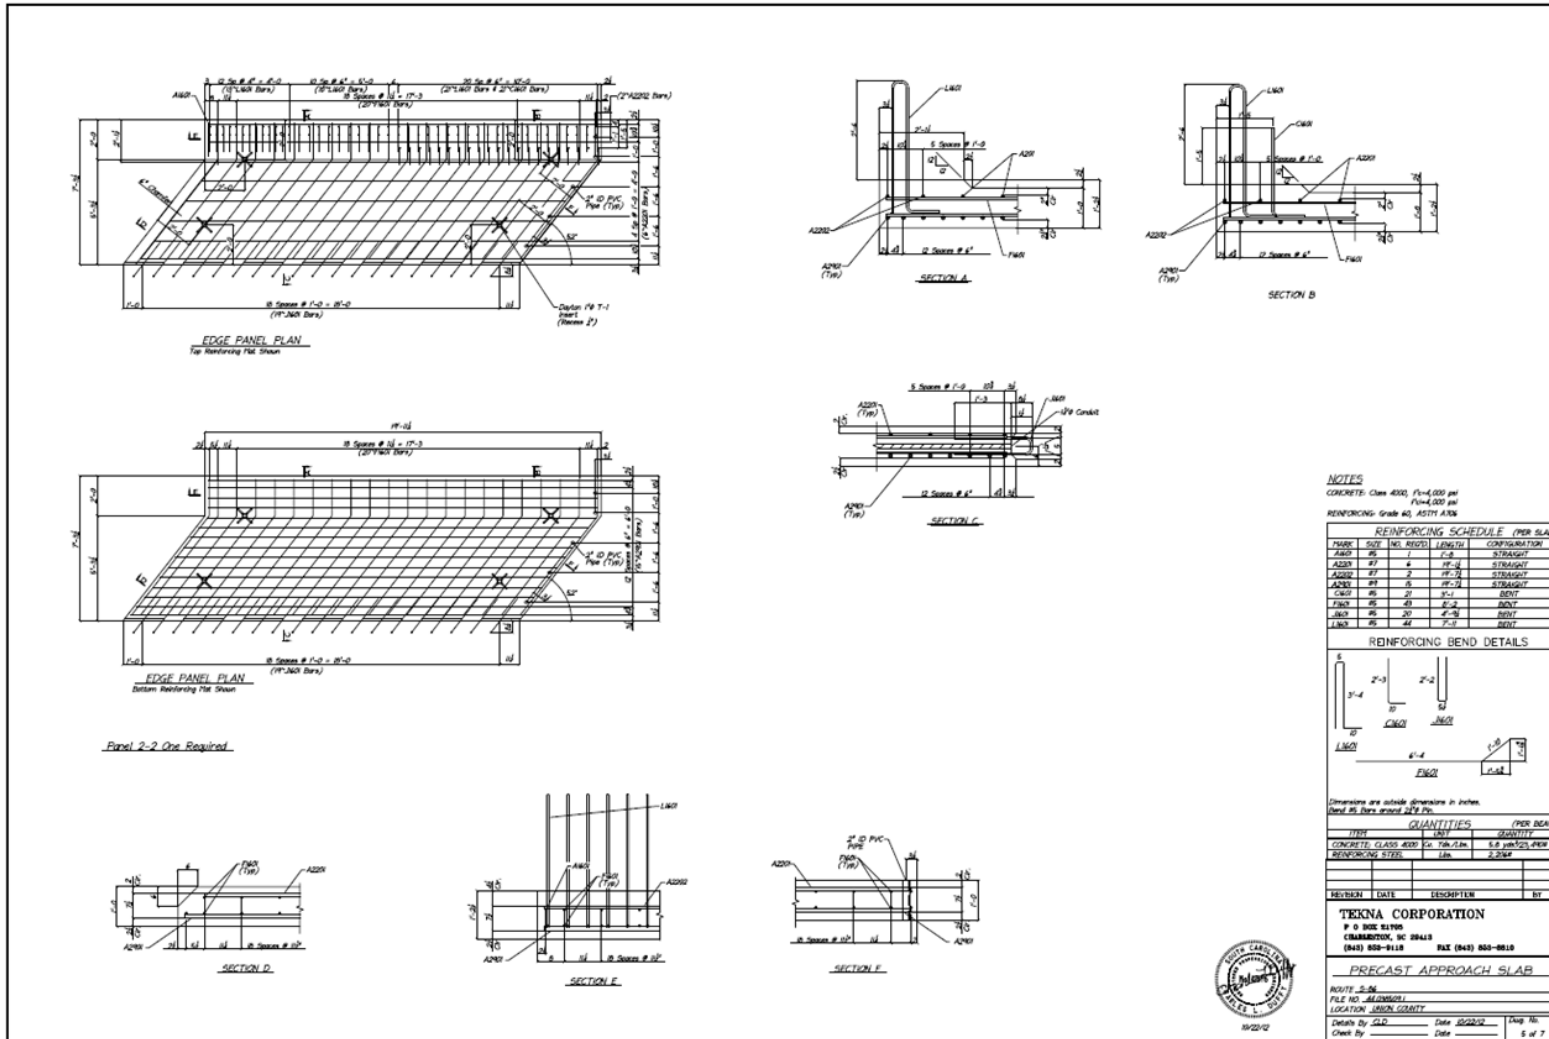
Bent Four 'exterior' slab 2-2 reinforcement schematic
